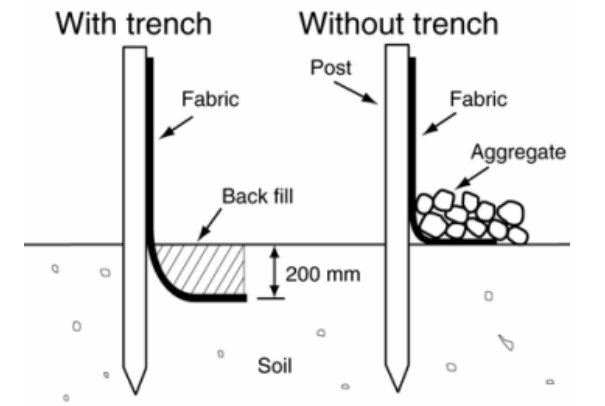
ALTERNATIVE SEDIMENT FENCE INSTALLATIONS (WITH OR WITHOUT FENCE)
